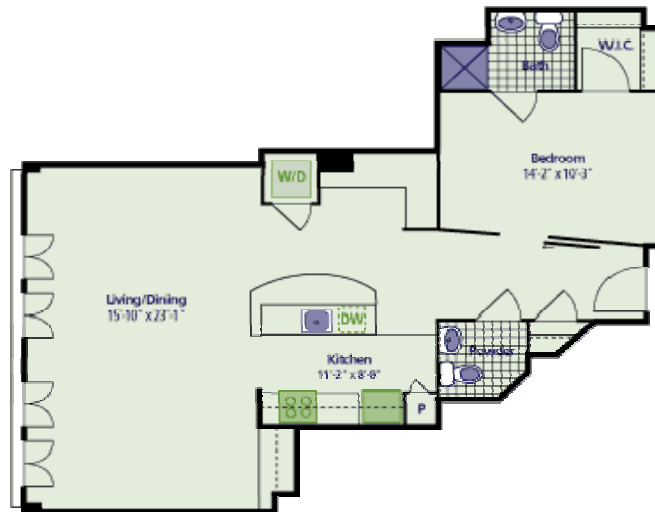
Kenyon Square – One Bedroom Unit Plan (903 sq. ft.)
